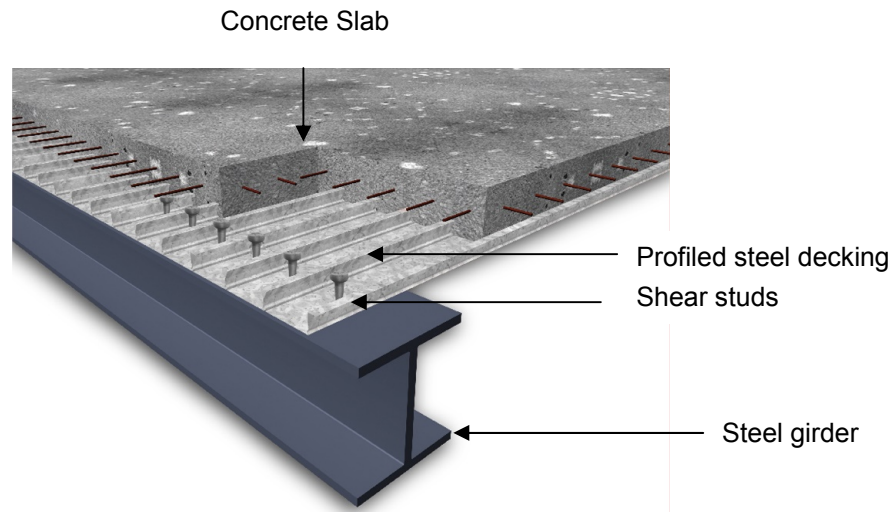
A sketch of a steel-concrete composite slab, [Duowei webpage]
